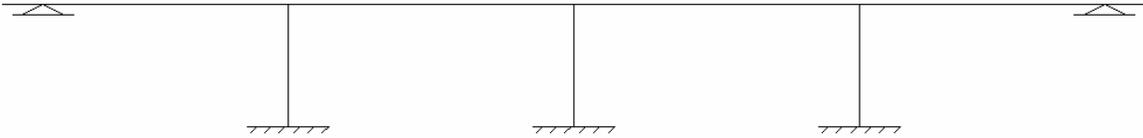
Bridge built with the cantilever Method using a central hinge
